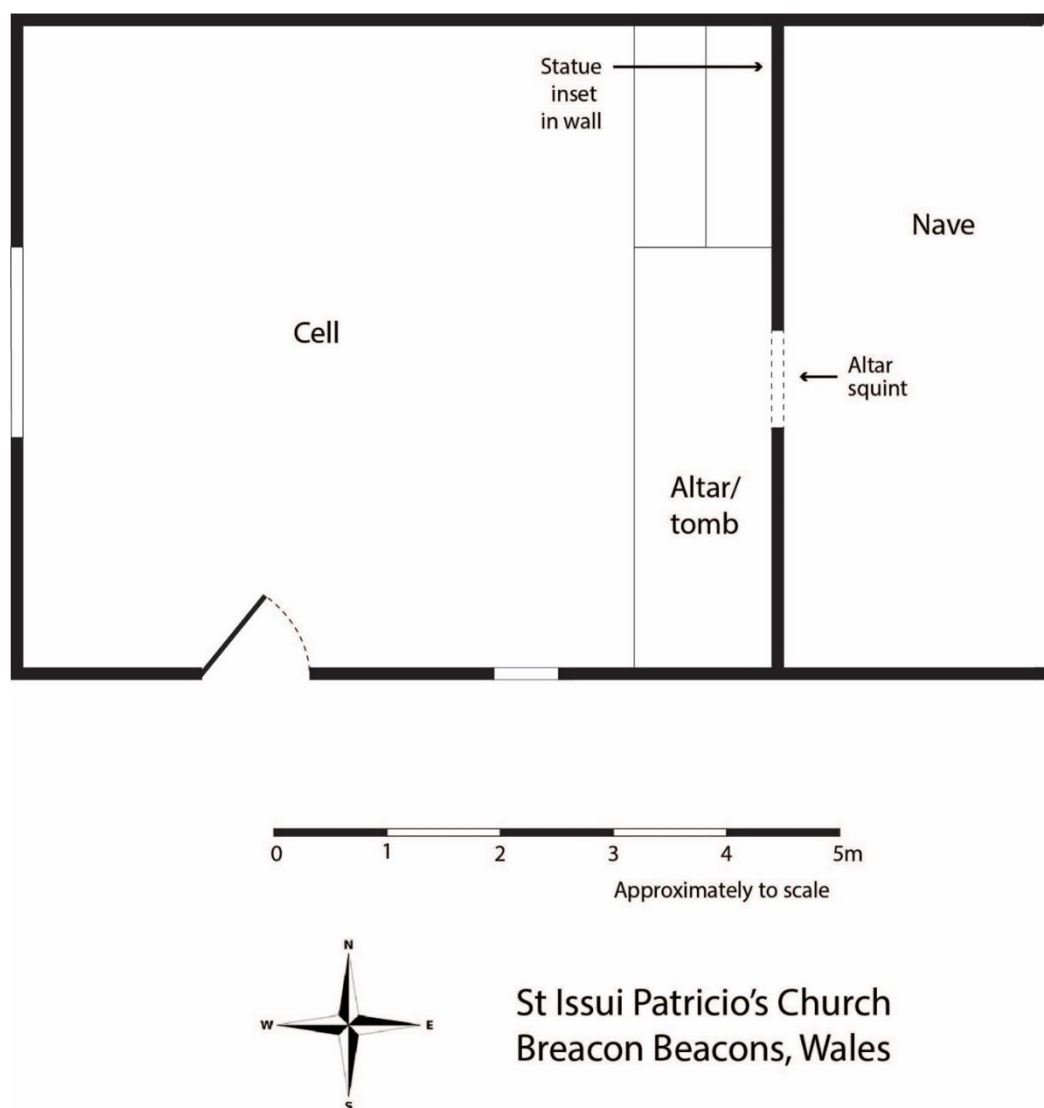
Floor plan of the anchorite cell at St. Issui Patricio's Church.
